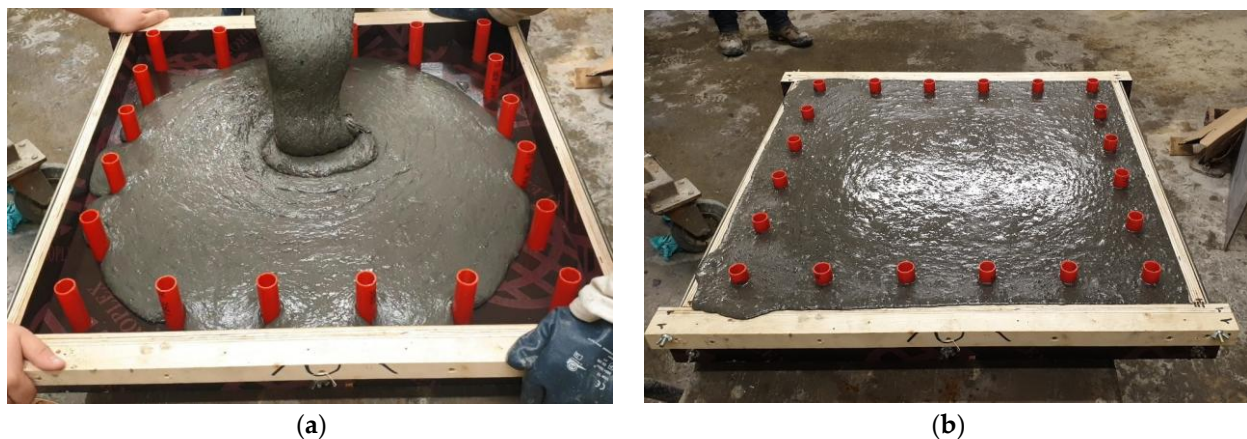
Casting of the UHPFRC plate: (a) during casting; (b) after casting.
